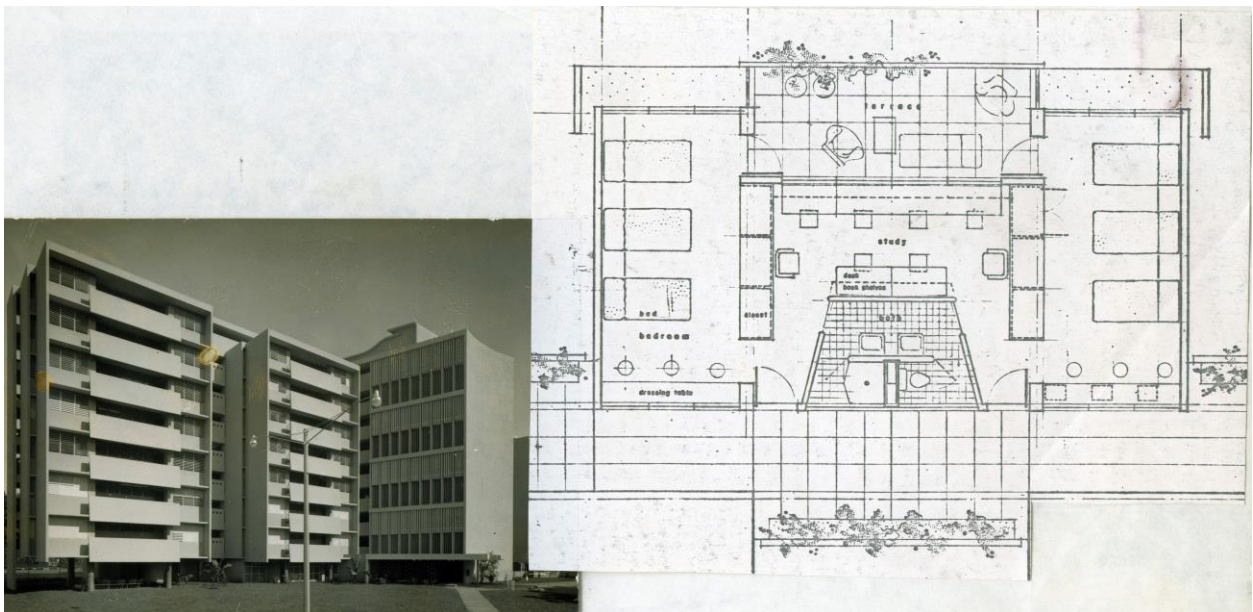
Portion of the exterior façade looking east (c. 1960-1970) & unit's typical plan. The dormitory units are handled as individual pavilions (modules) each of which houses two bedrooms, sharing common facilities, for a total of six dwellers. *Nominación del Dormitorio de Señoritas, Universidad de Puerto Rico, Recinto de Río Piedras* (2017).
